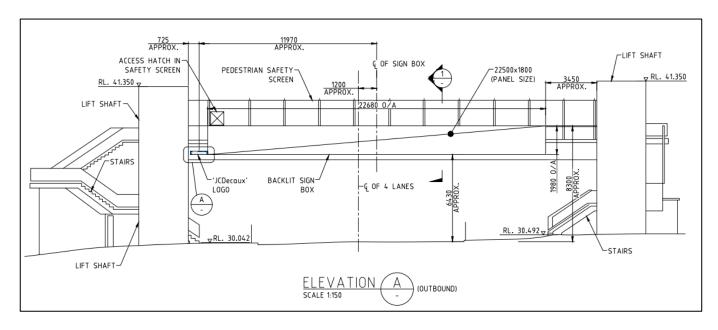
| Sign elevation – southwest (Source: Revised architectural plans 01/1124)
